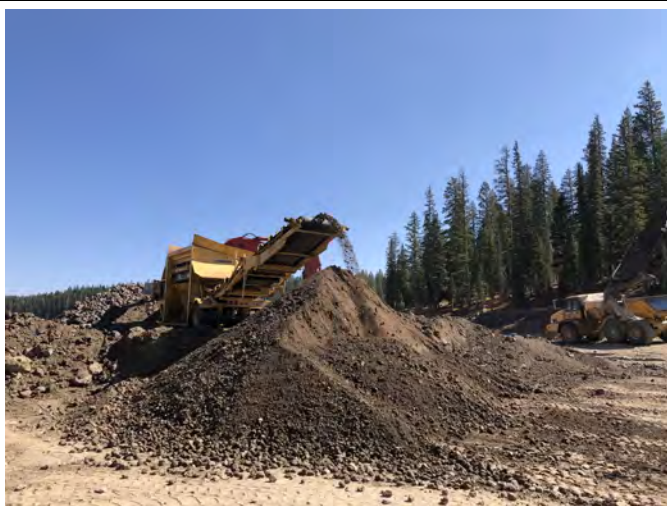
View of embankment material screening plant processing embankment materials prior to placement.
